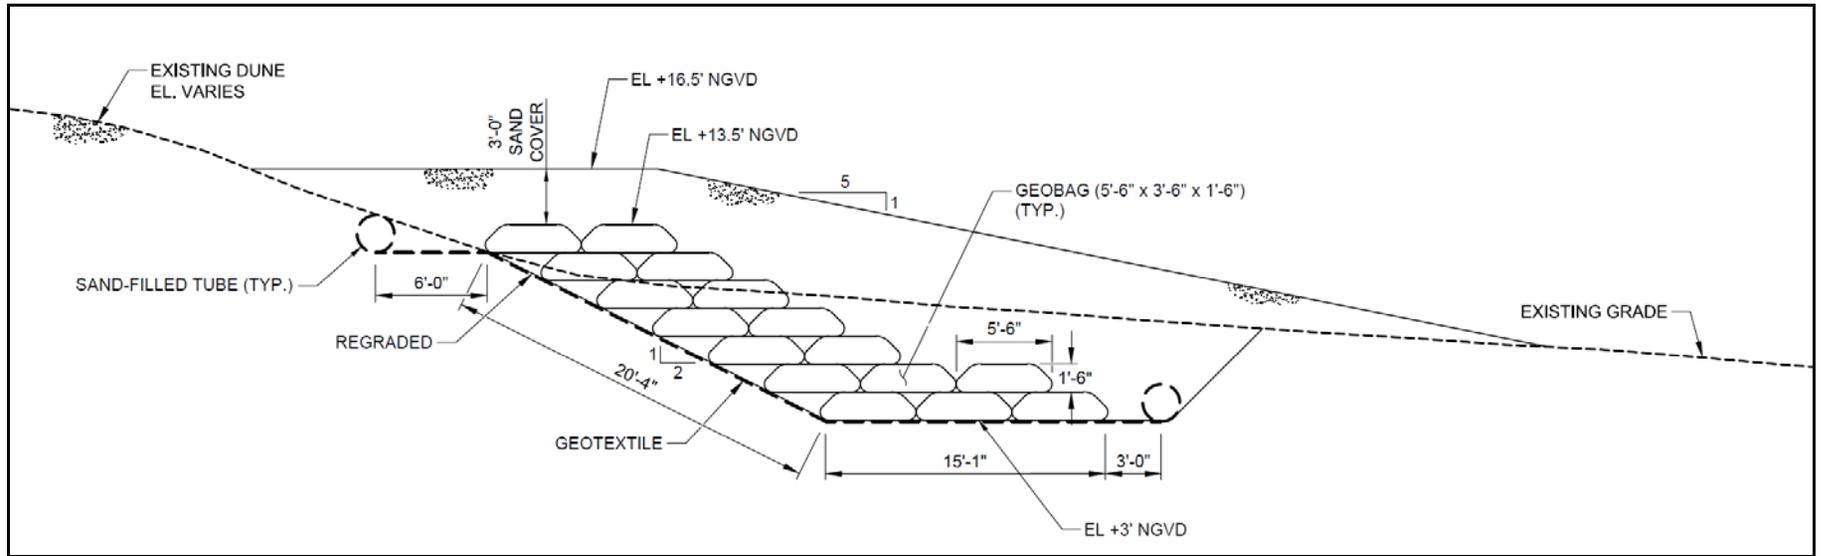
Reinforced Dune Typical Section, Downtown Montauk Stabilization Project
